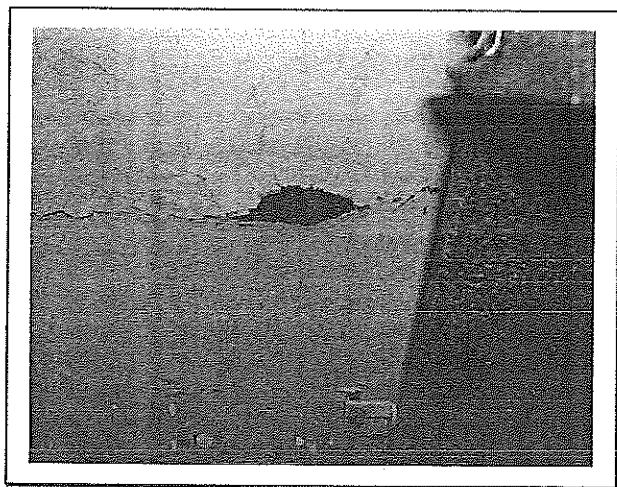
Viewing white insulation between cork layers, Basement A/C room.
